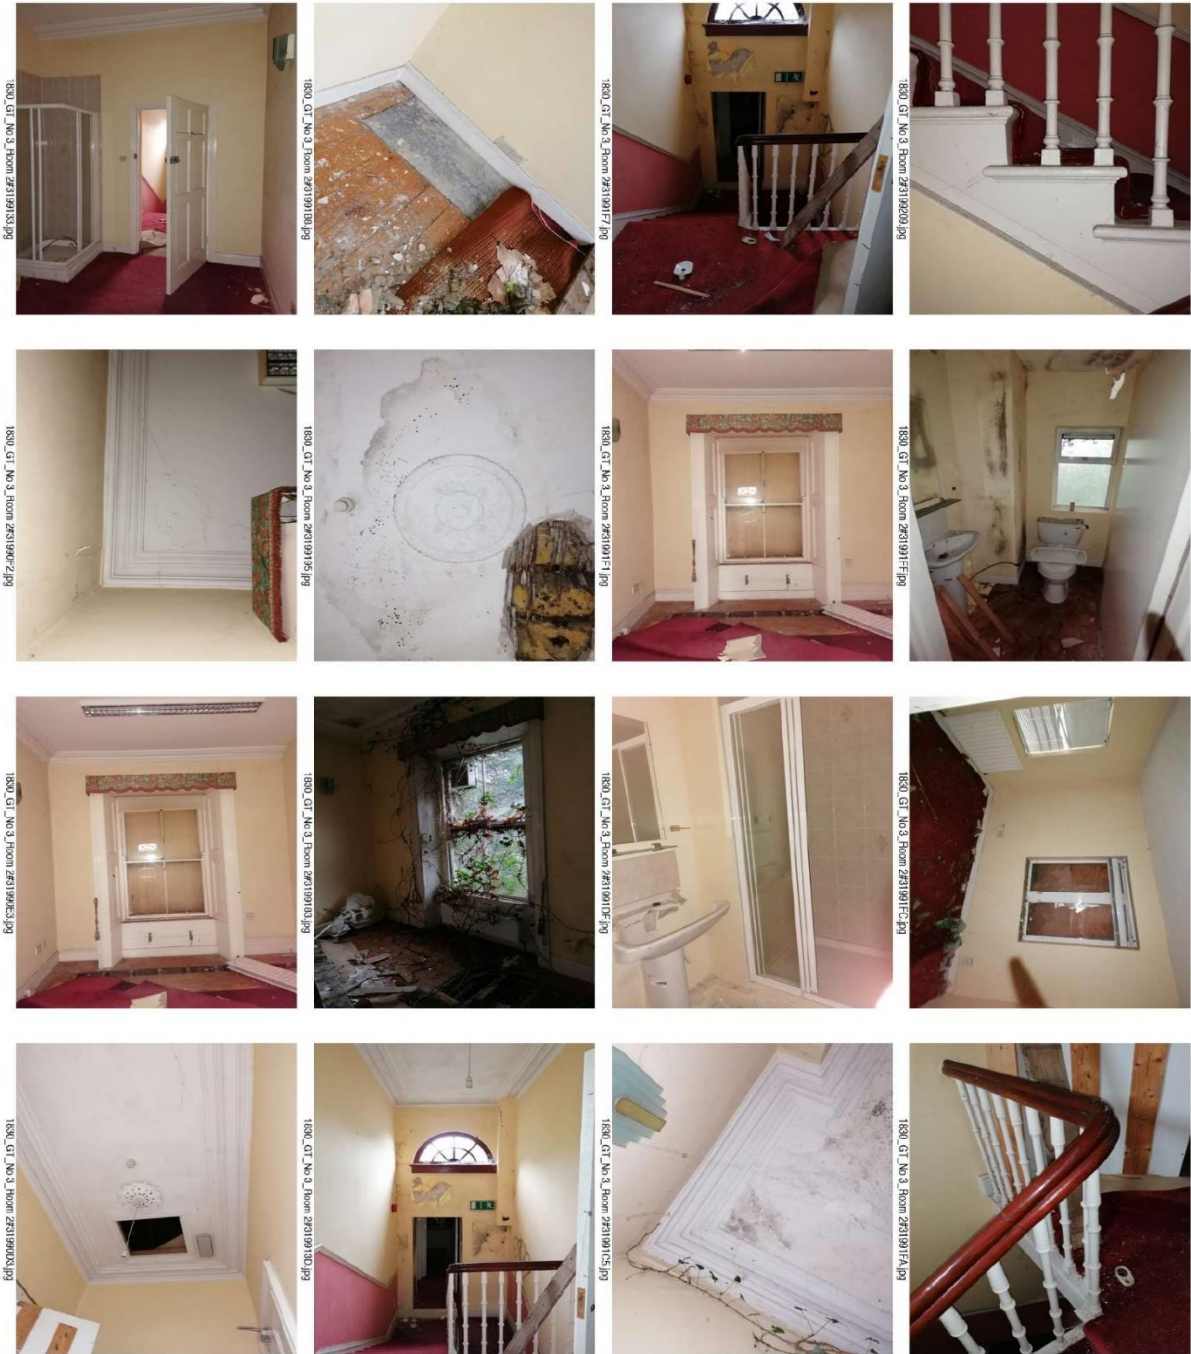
B.8. No.3 Glenville Terrace, First Floor Record Photographs
